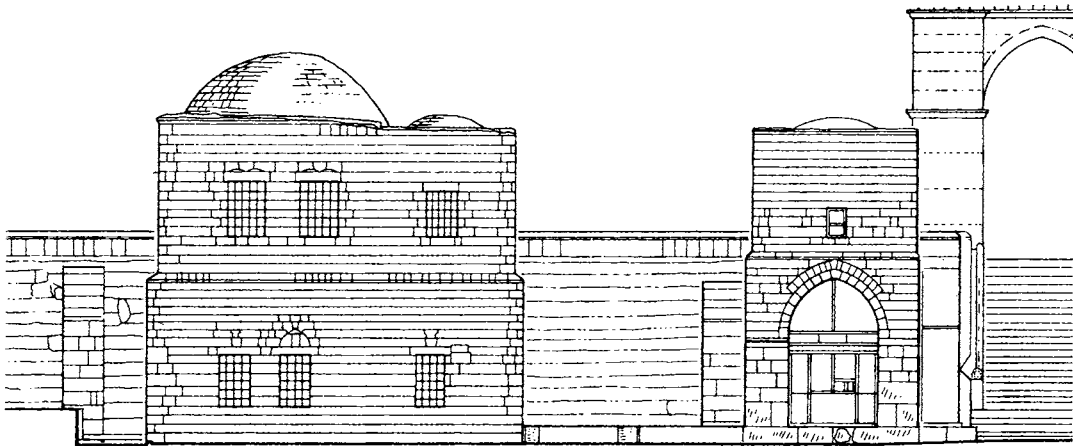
Khalwat Bairam Pasha, west elevation.
